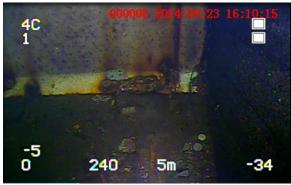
Corrosion of steel plate along spillway at El 106.7 m, corner junction at J1 (refer to Section A-A dwg S2, 2006).
